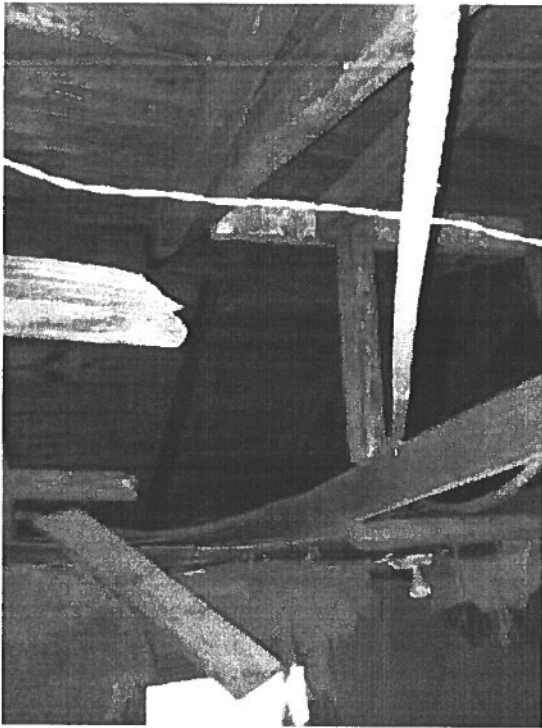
Collapsed Section of Wooden Roof Joists and Beams
